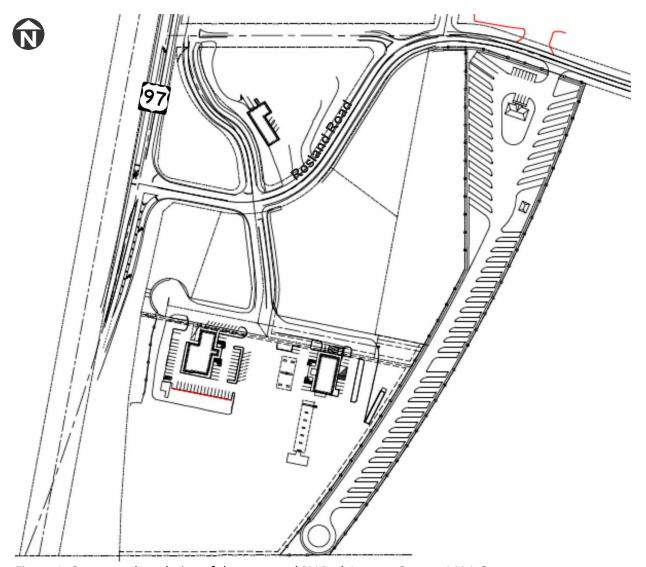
Conceptual rendering of the proposed RV Park Layout. Source: MAA Group.
